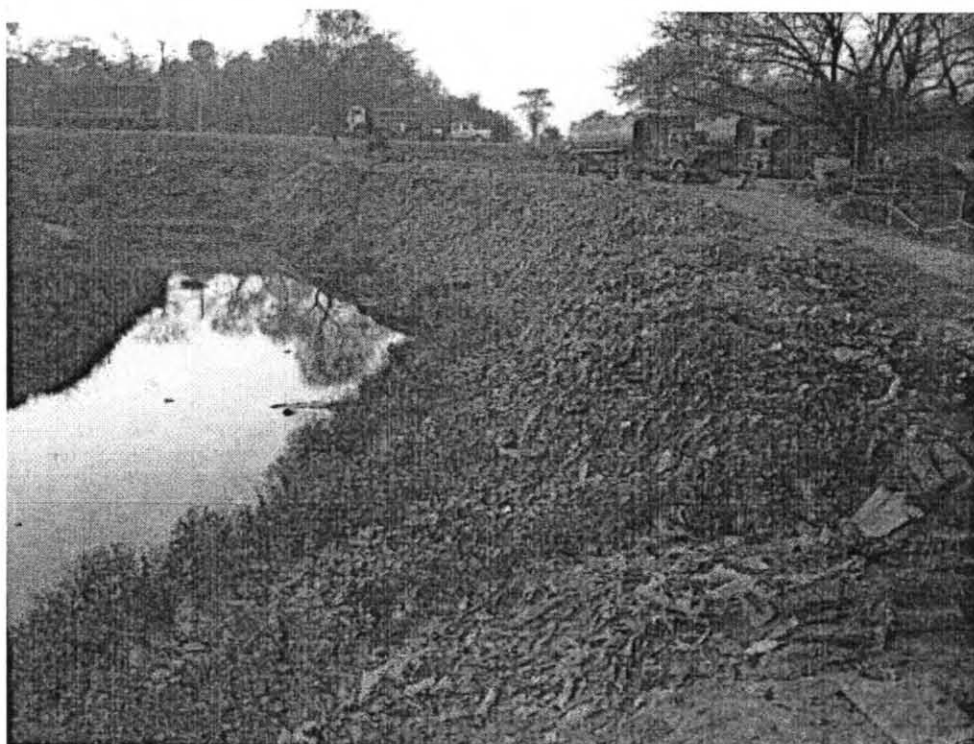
Final Disposal Site D-7 at Sirsiya River bank east of TRP
